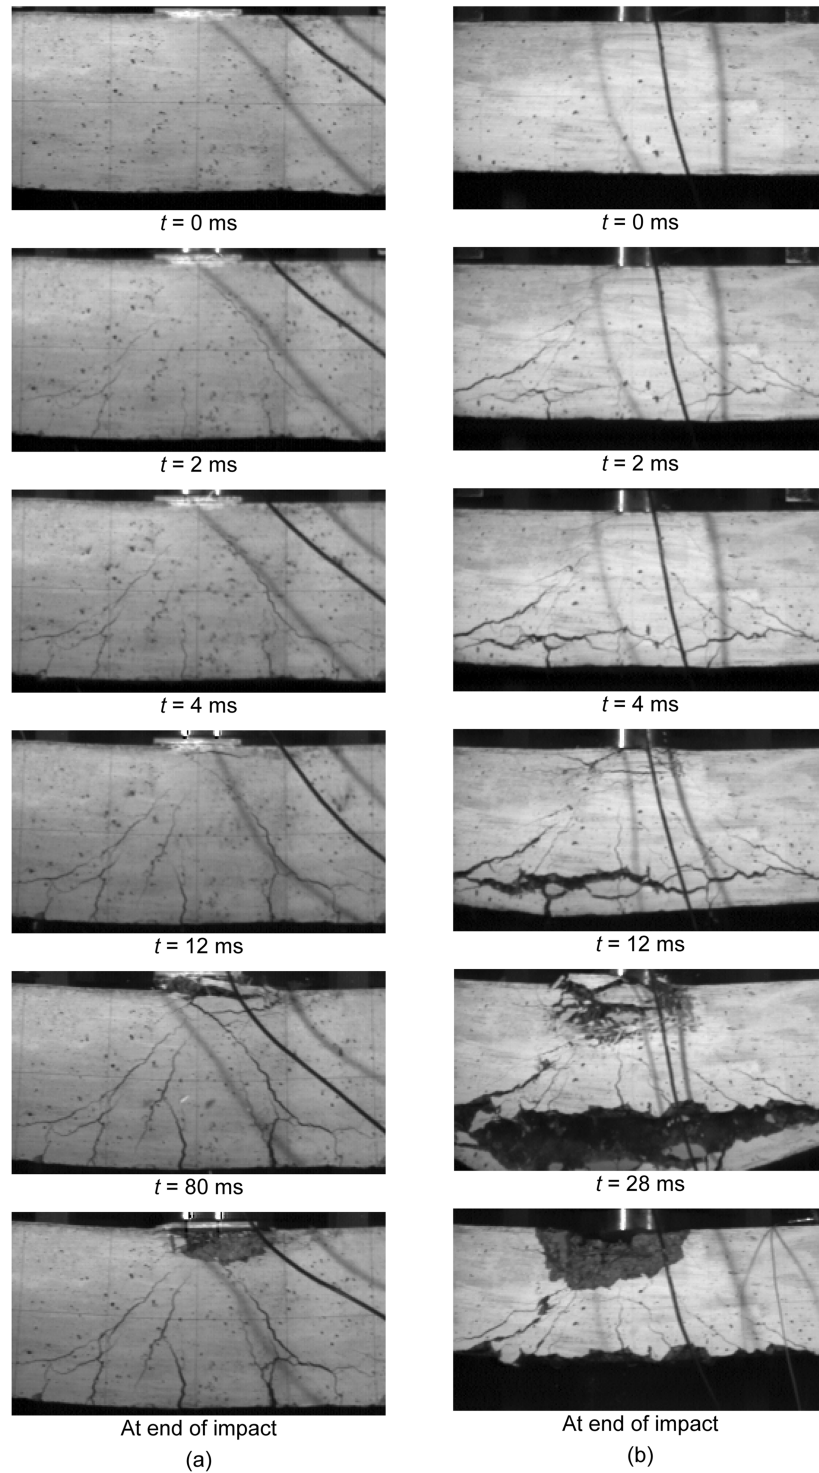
Beam crack propagation, spallation and scabbing formation
